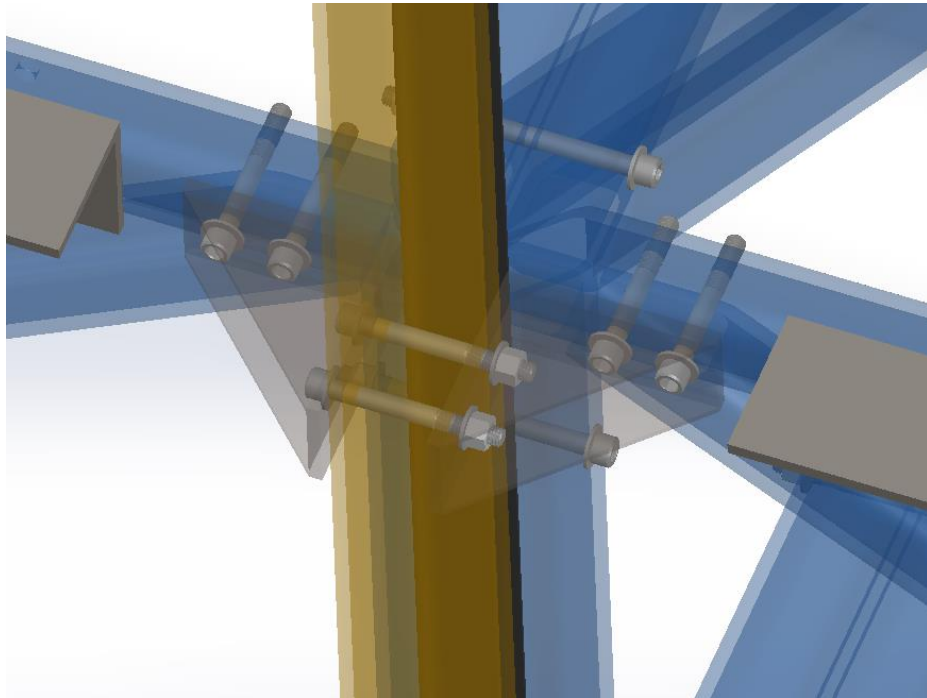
Side view of chassis to chassis modules bolt connection.
